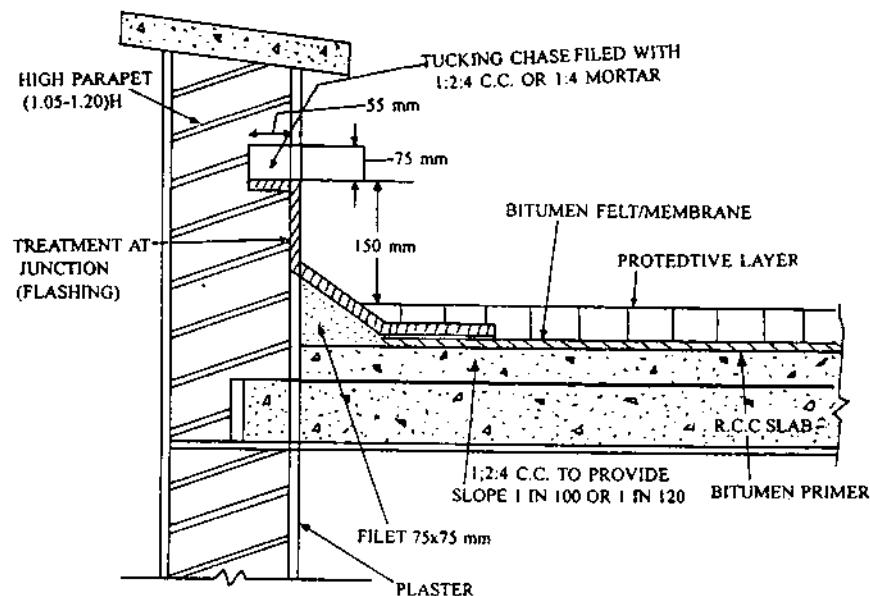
Bitumen felt membrane water proofing system for flat roofs
